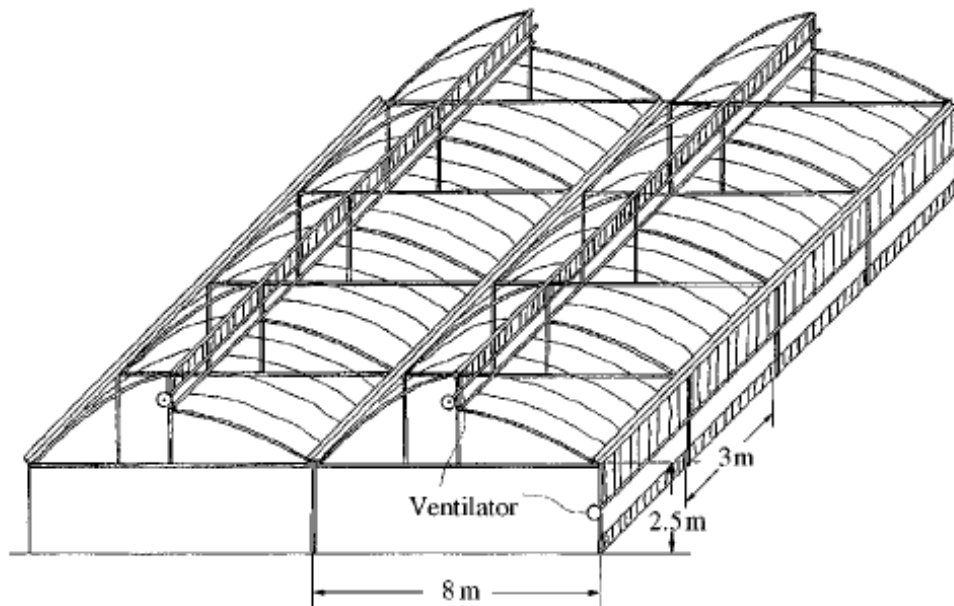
Plastic covered greenhouse with ridge and sidewall ventilation
